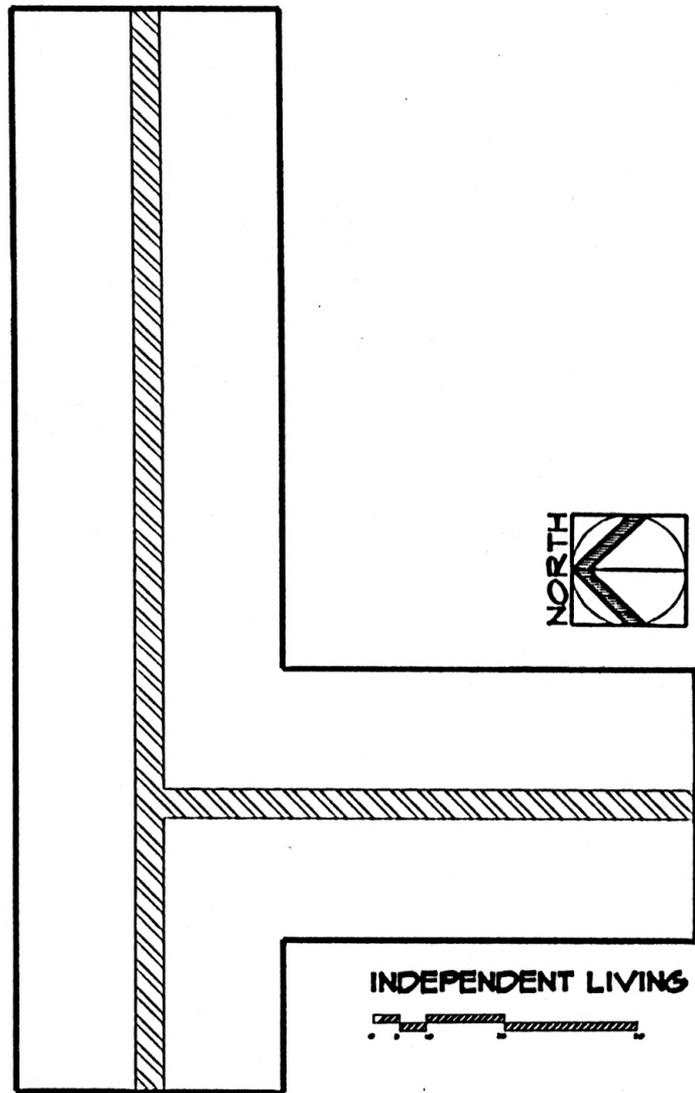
Plan of Independent Living Hallways - Site 3.
